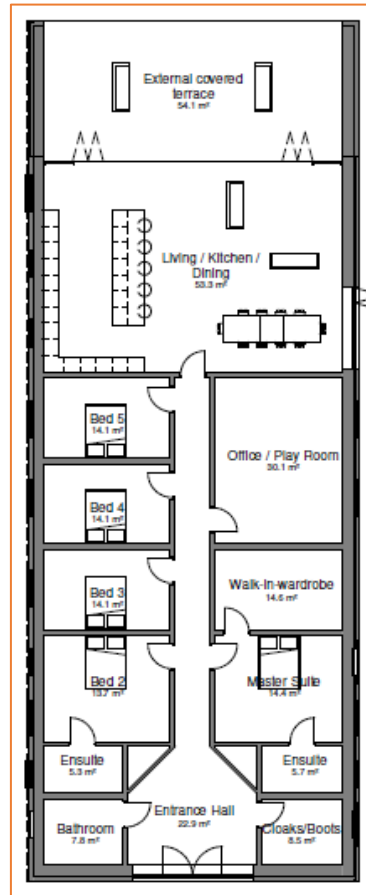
Proposed Floor Plan (Source: Solidvoid)
